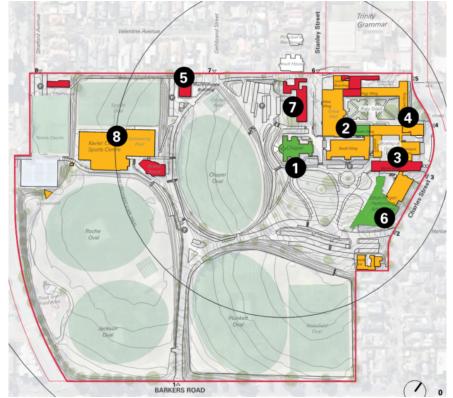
Xavier College existing layout (Source: Applicant submission)
